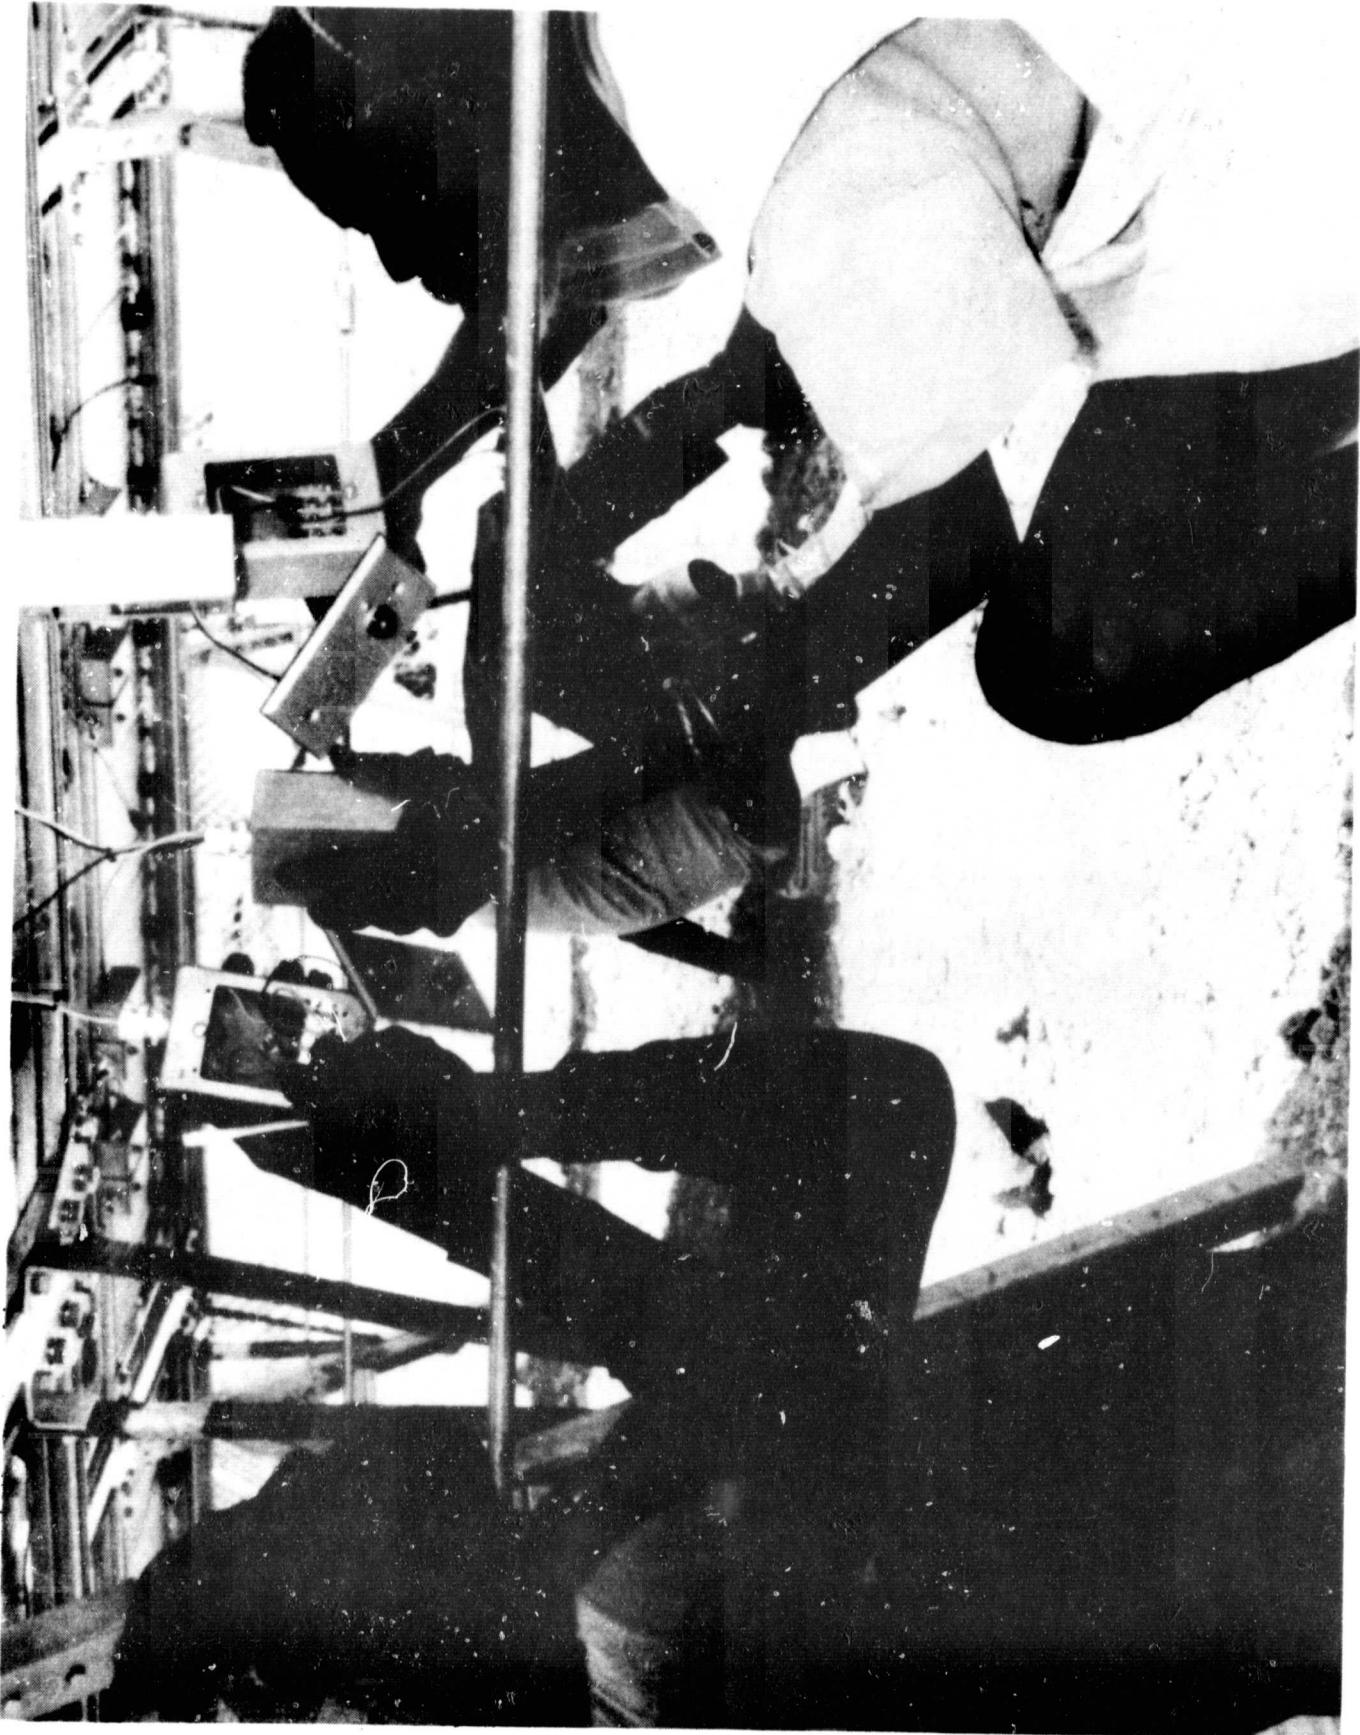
Electrical Wiring Work for PV Array, Tangaye, Upper Volta
